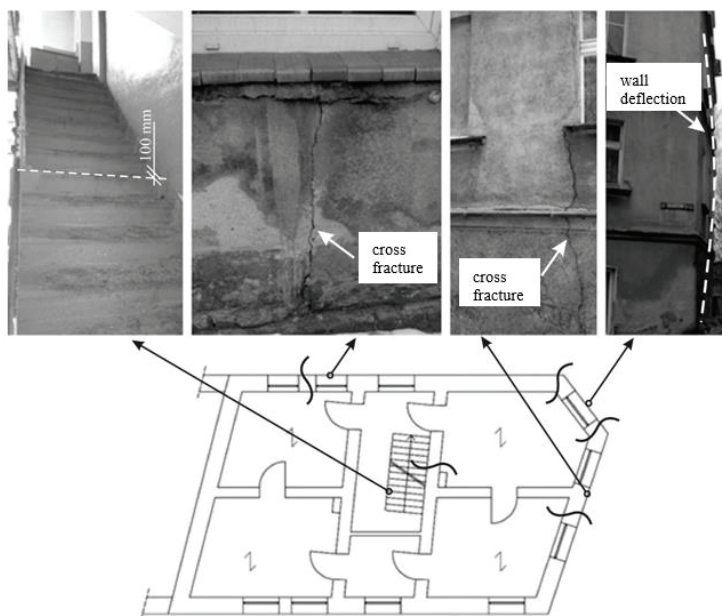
Sketch of the second floor of the analysed brick masonry building, with photos documenting the cracks of masonry walls and deformation of the stone stairs that run from the ground floor to the first floor.
